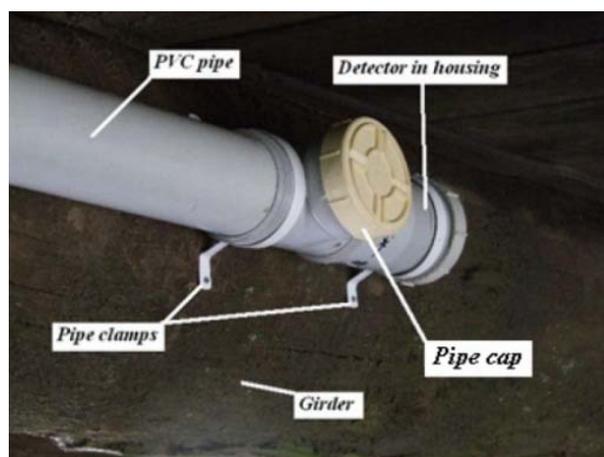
Detector mounted at girder mid-span (Moore, 2009)
